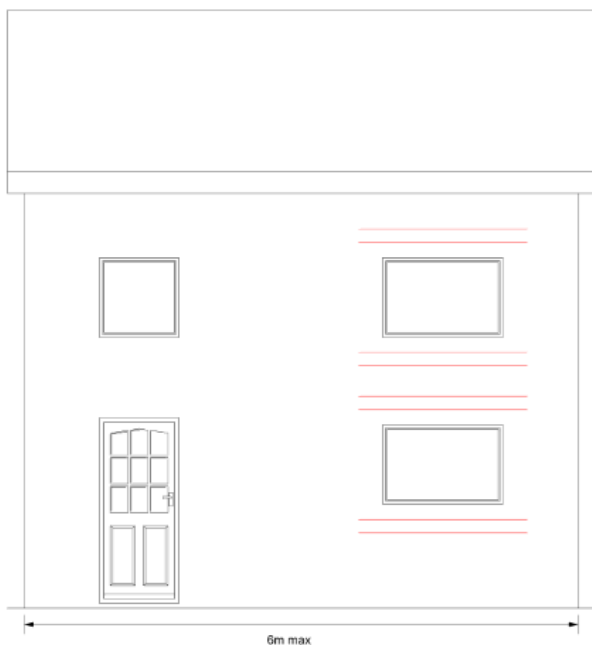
Example of reinforcement above and below openings exceeded 1.5m
